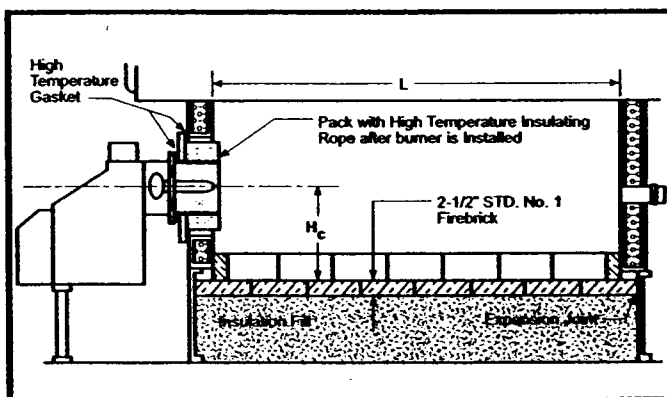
Type "S" Burner Installation Firing Firebox Boiler through the Door
